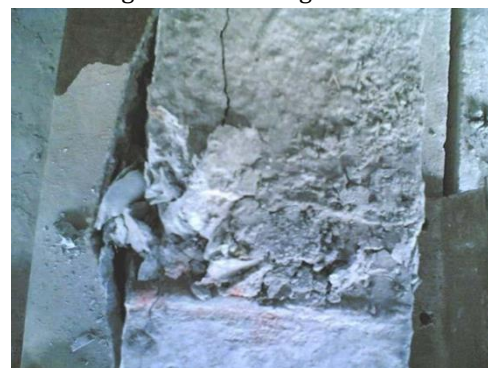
Crushing of Concrete in Balanced Beam Retrofitted with GFRP Jacketing
